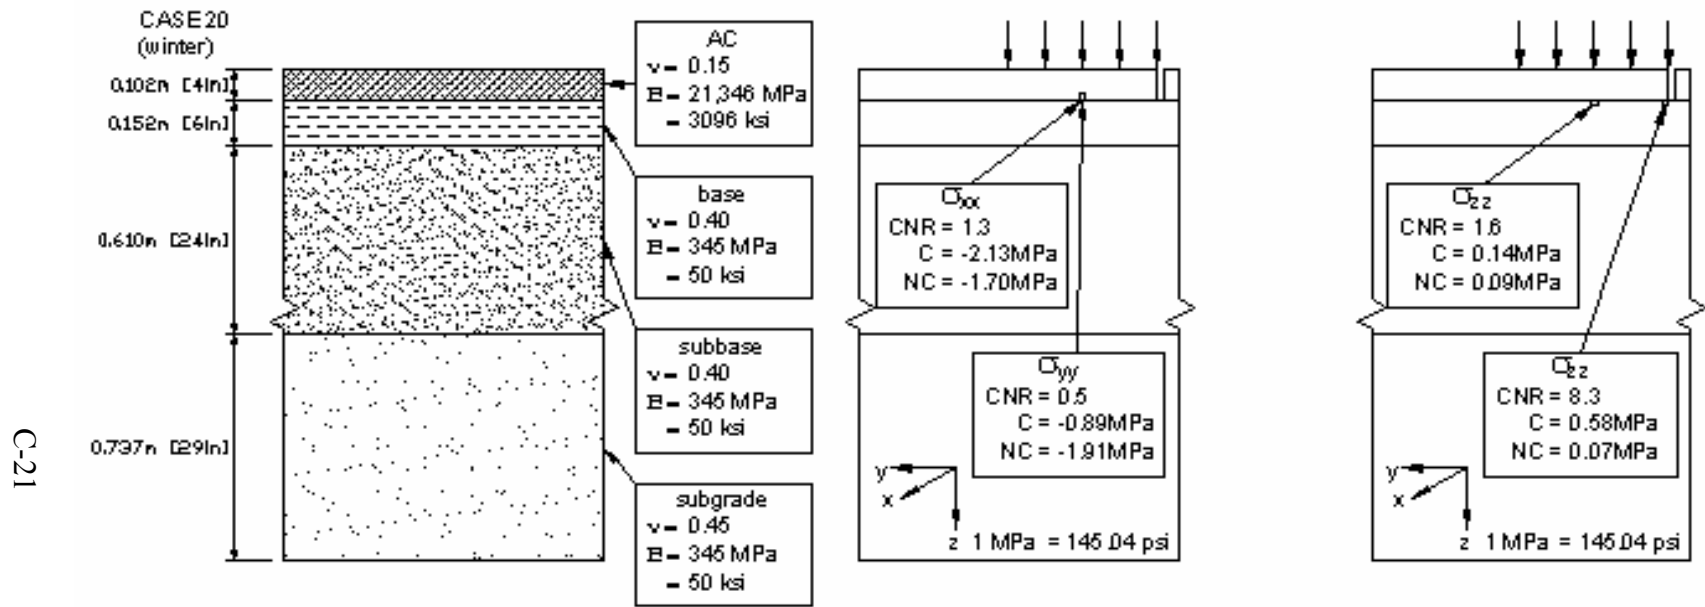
Summary cross section for case 20, (C – stress in cracked pavement, NC – stress in pavement with no crack, CNR – crack/no crack (stress) ratio)
